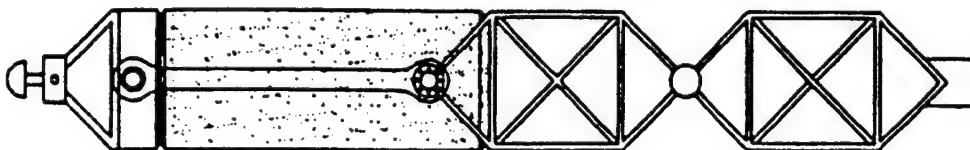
Structural layouts of the in-house connection, [Hatch, 1985].
